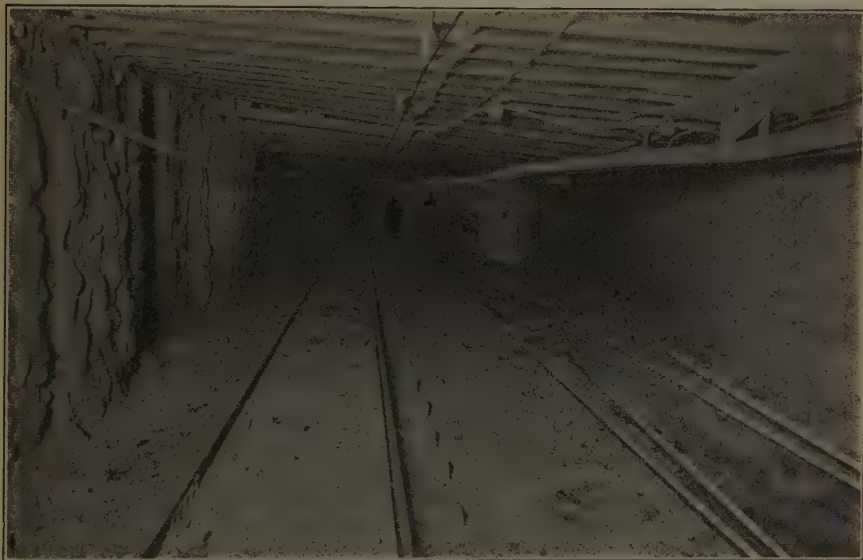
STONE PACKWALLS IN HAULAGEWAY, NO. 1B COLLIERY.
